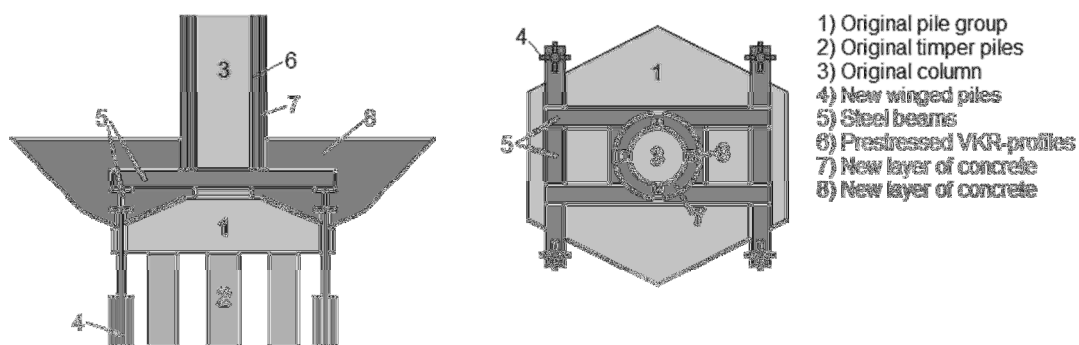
, Illustration of how the foundation at Odin was strengthened.
